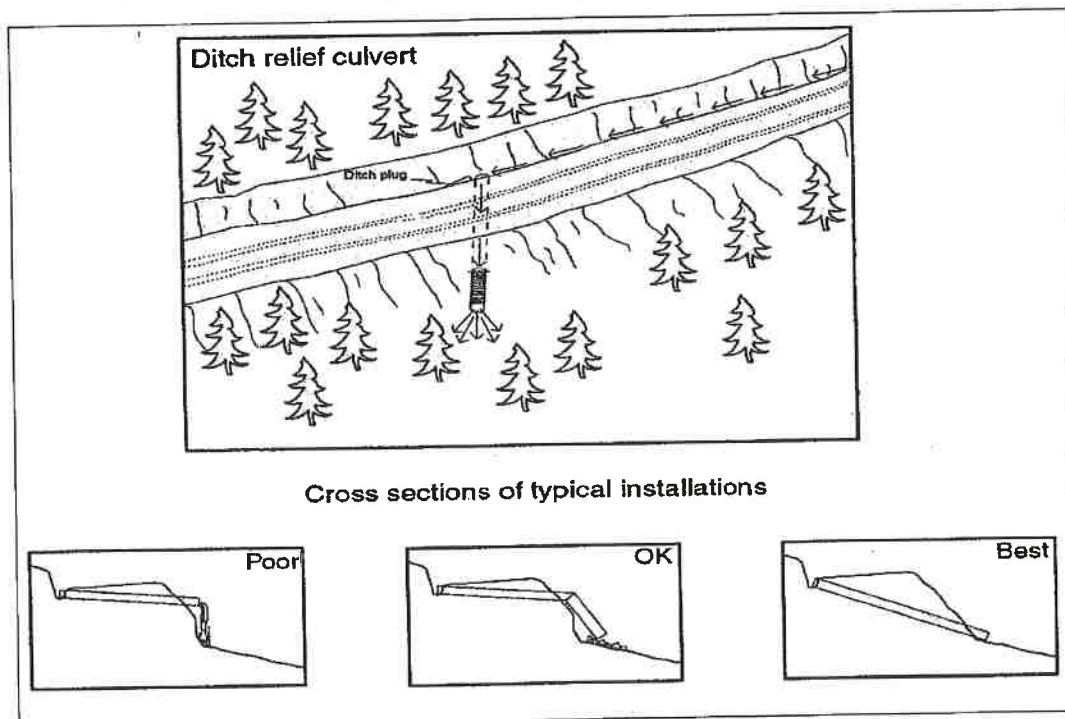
Typical ditch relief culvert installation. (CDFG, 2006)
